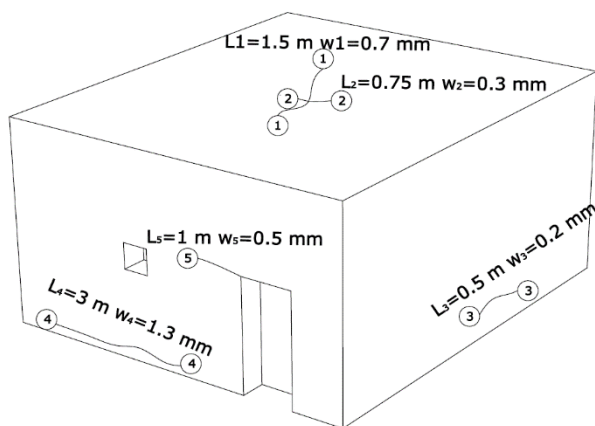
Sketch of cracks formed in the reinforced concrete room (front view)
